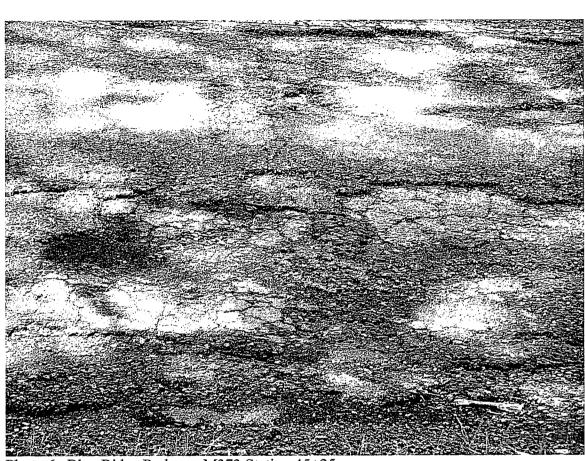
Blue Ridge Parkway M373 Station 45+25 Fatigue Cracking and Raveling (High Severity)
